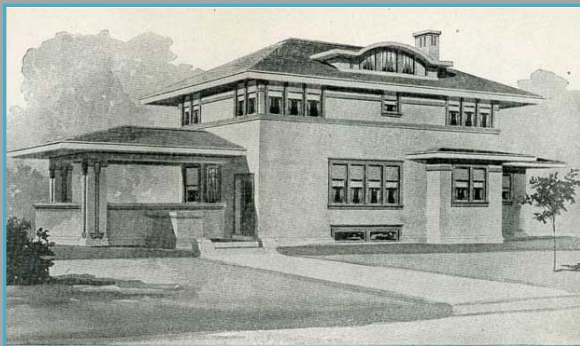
“Design No. 8215” (Radford’s 1909 Cement Two-Story Plans)
